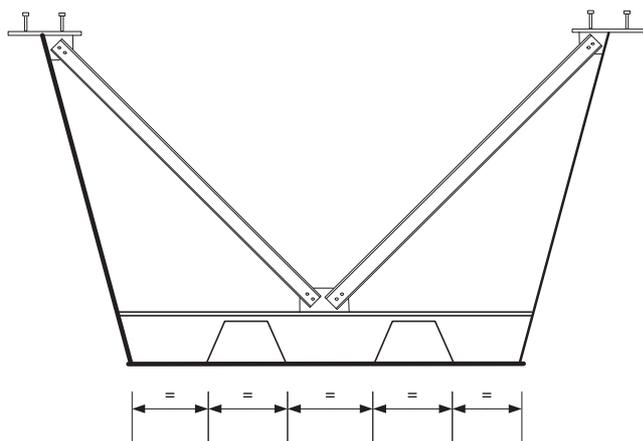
Box-girder with trapezoidal stiffeners on the bottom flange.
